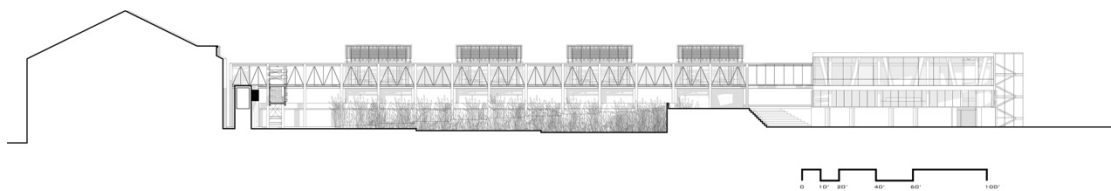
, Bridge & Science Labs, North Elevation (Source: Author)
